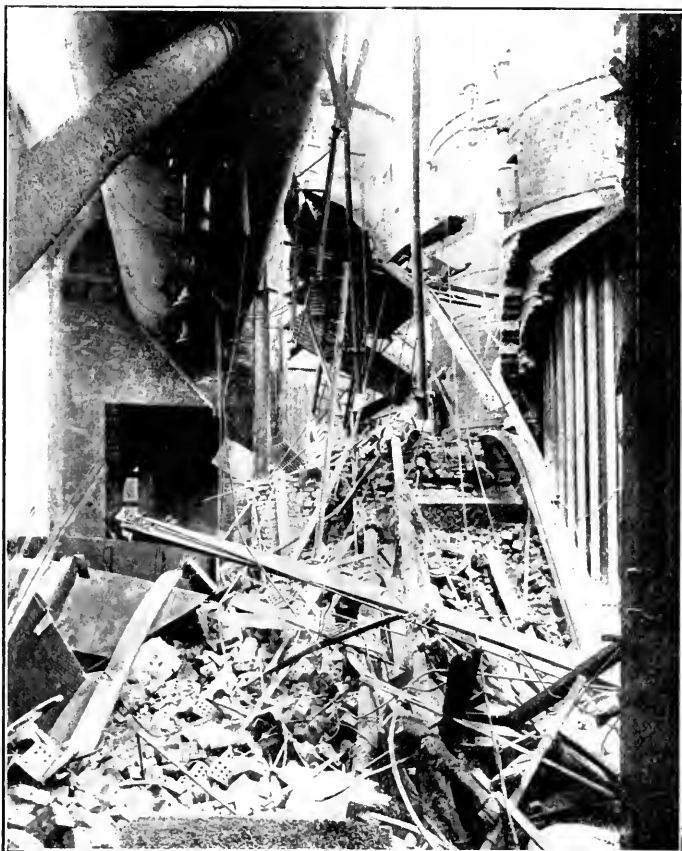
BOILER EXPLOSION, STATEN ISLAND.
